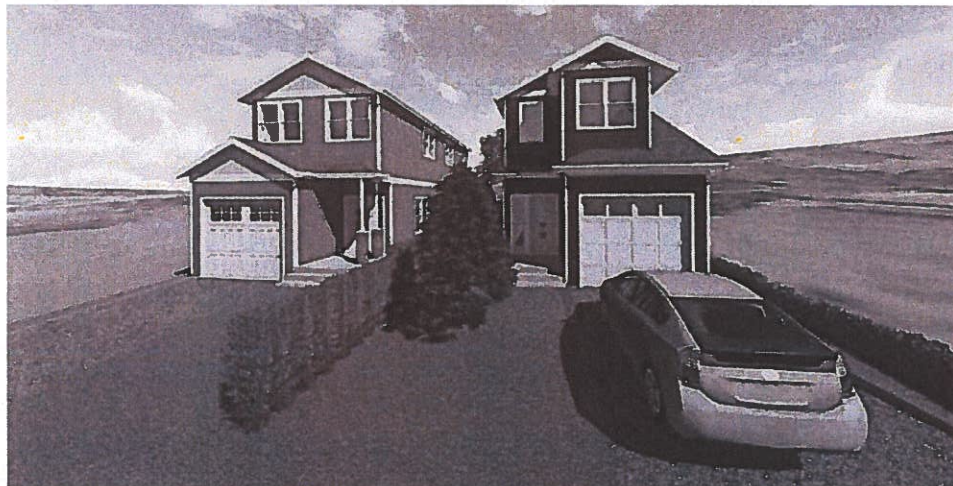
Proposed House Design (Lots 2 and 3) (from plans by *Envision Designs & Development*)
